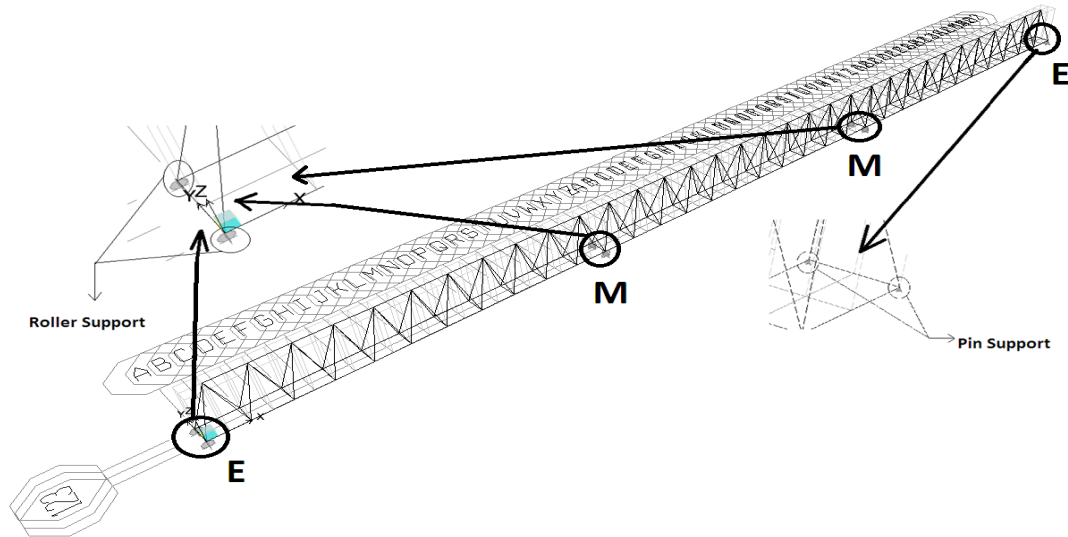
Precast joist supported at the ends by the Girder and with two temporary intermediate supports
